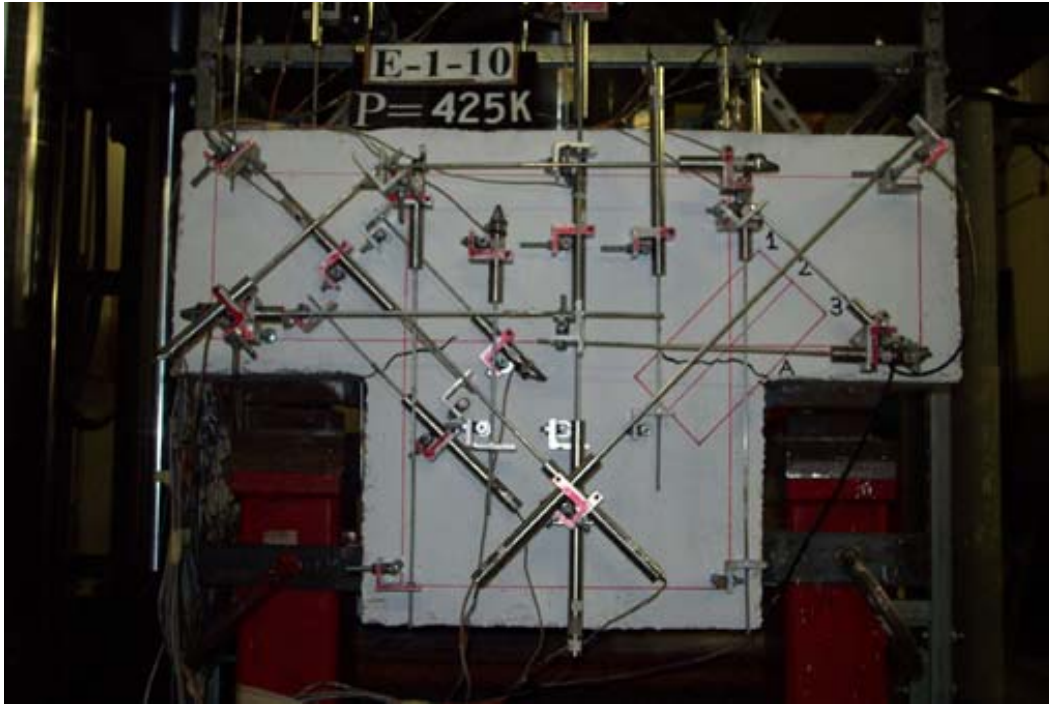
(e) Horizontal cracks in Specimen E-1-10
